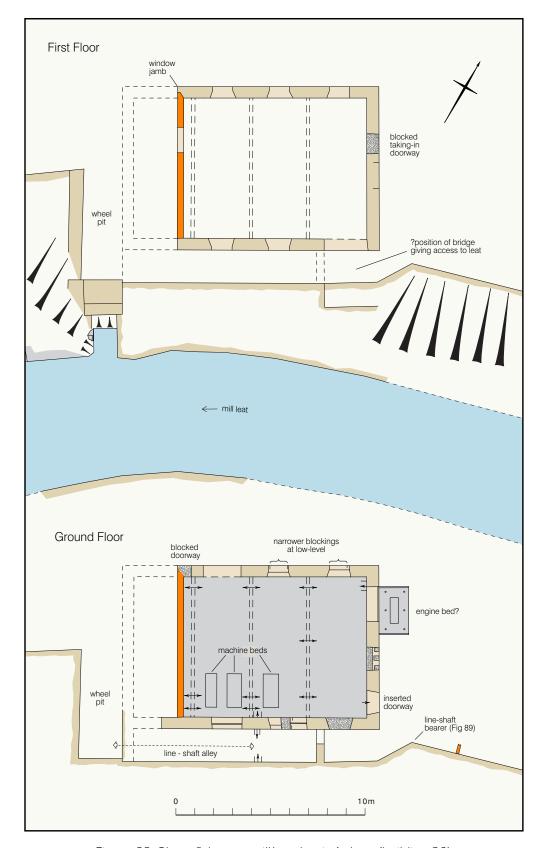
Plan of the sawmill/mechanics' shop (building 20) (Drawn by Naomi Archer and Philip Sinton. © English Heritage)
